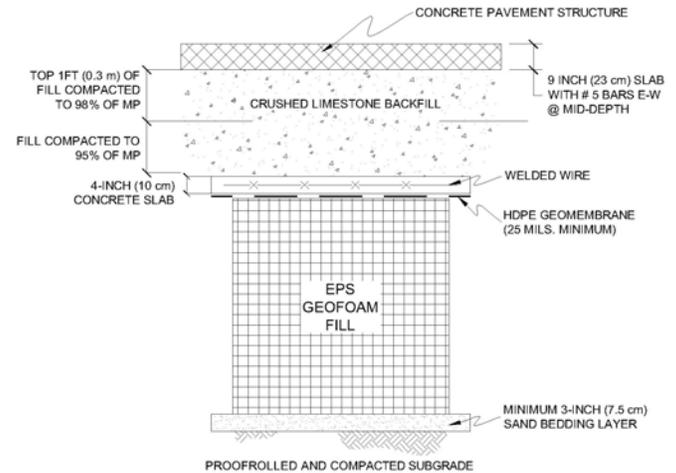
EPS GEOFOAM LIGHTWEIGHT FILL EMBANKMENT DETAIL (CROSS-SECTION)
